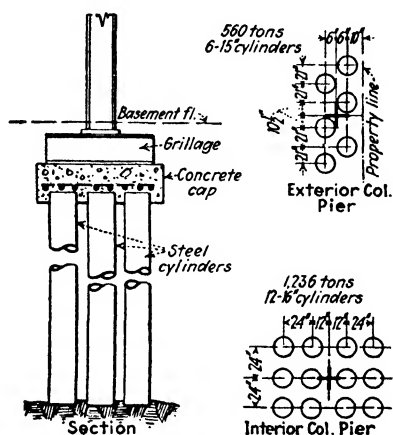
Steel-pipe Pile Piers for Starrett-Lehigh Building in New York City.
